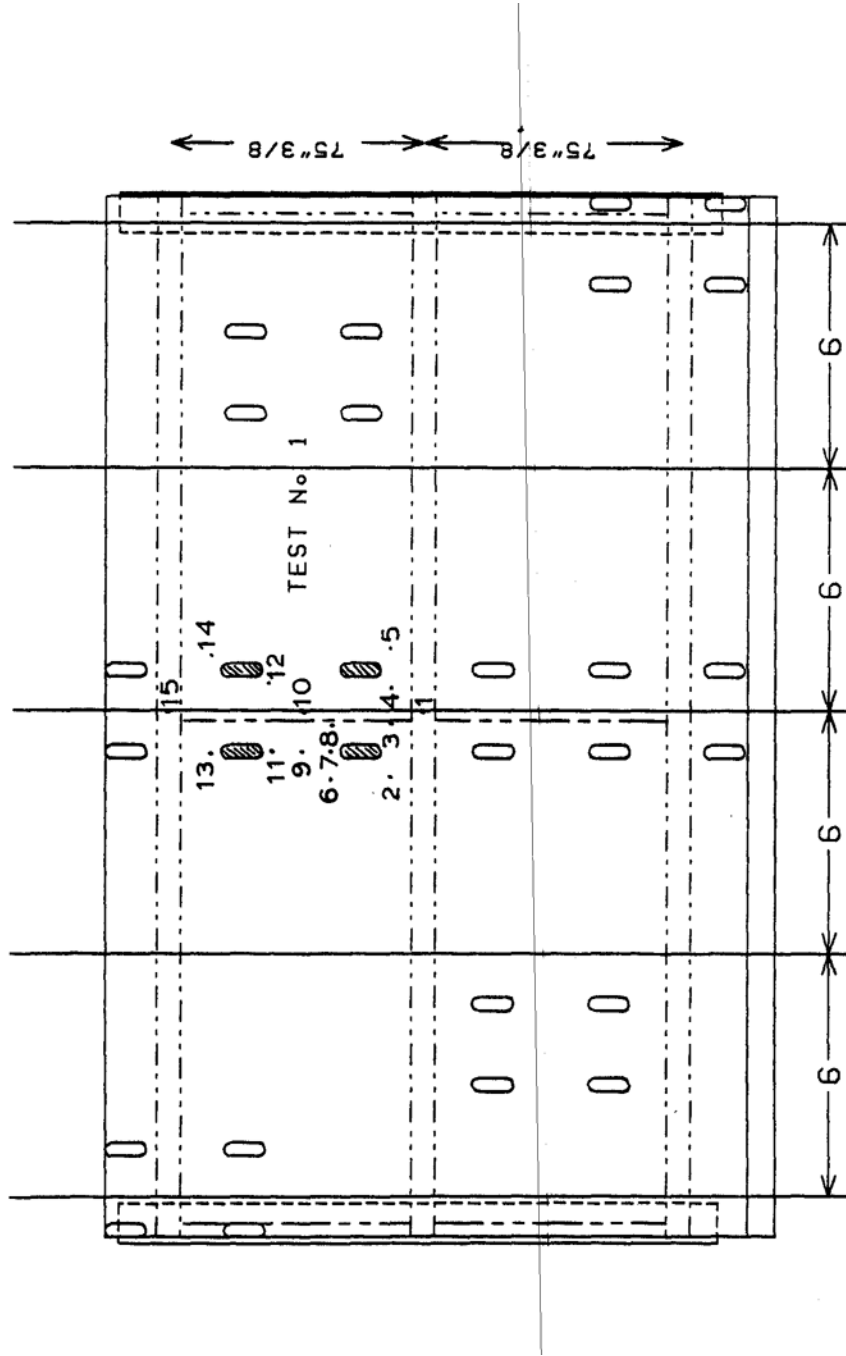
LVDT Locations (Second Bridge - Test No. 1)
